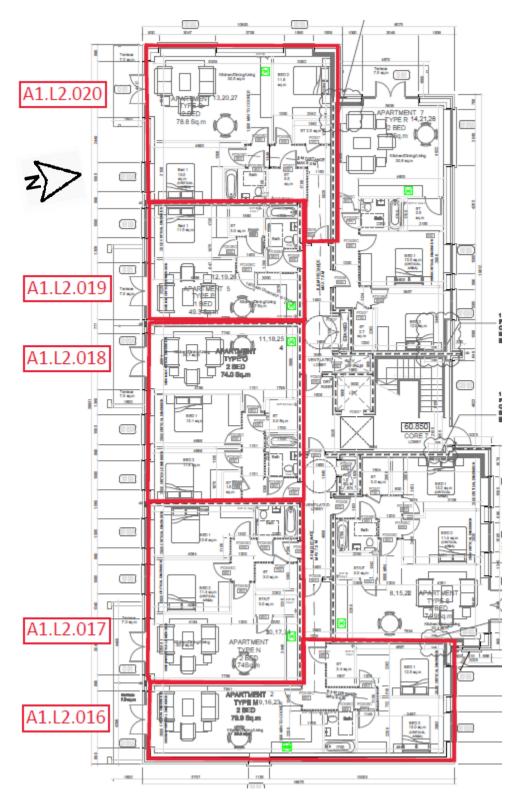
Floor Layout of the Existing Block A1 (Pappan Grove) – Second Floor
